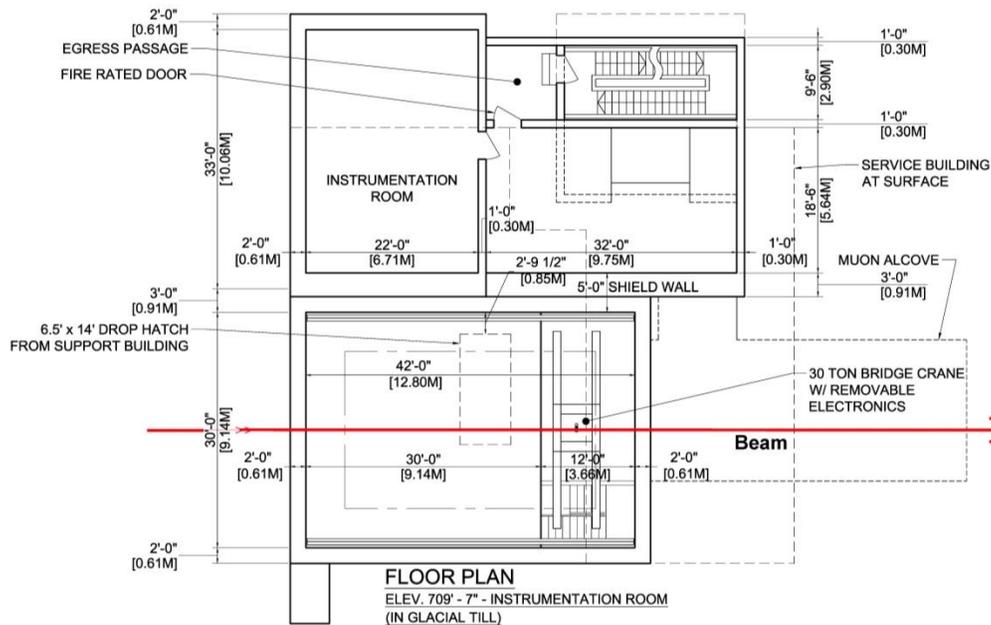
Absorber Hall Instrumentation Room; Upper Level, plan view in soil.
